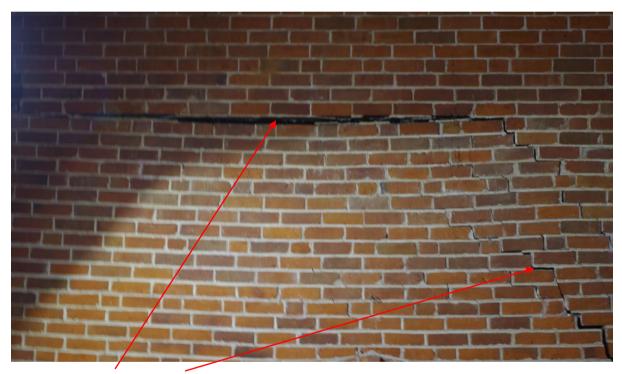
Substantial cracking to internal brick wall above Chapel arch. (Source: Michael Scott, Feb 23)
